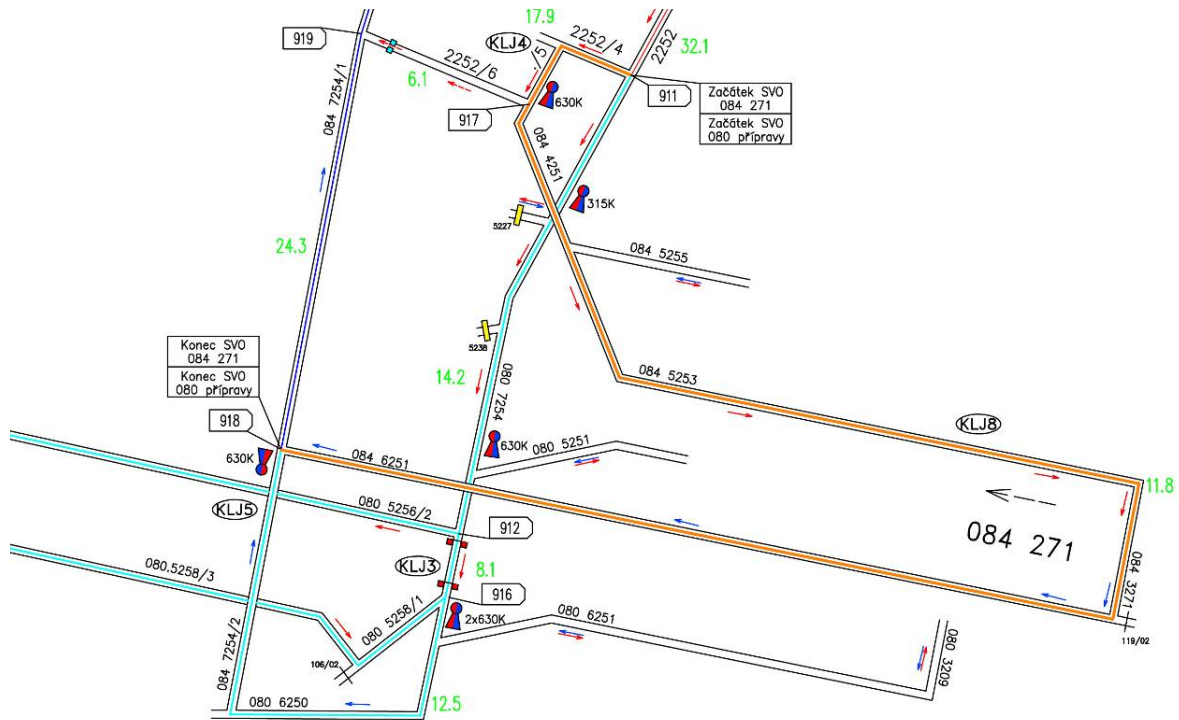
Plan of the face No. 084 271 with the U-type ventilation system.
